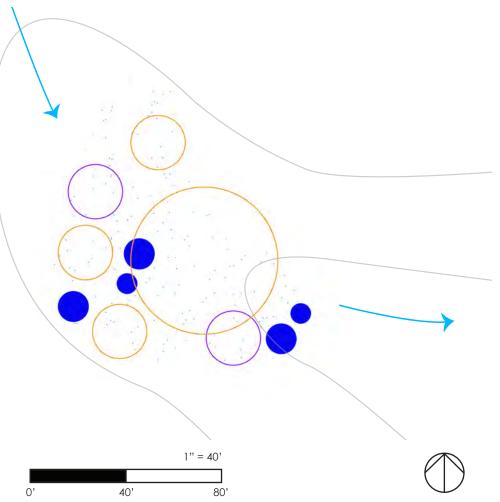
North Jardine Bioretention Site D Planting Plan and Palette.
